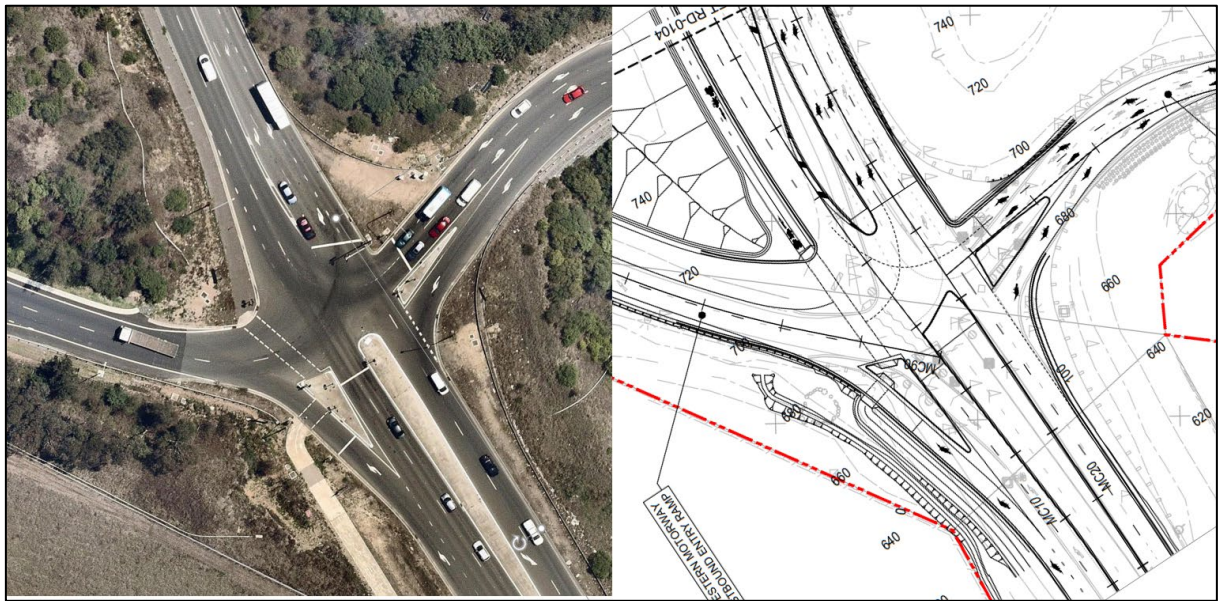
M4 Westbound Ramp (South) – Existing and SMEC Plans
